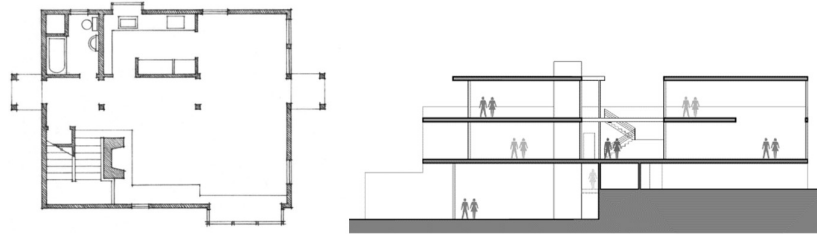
Hand-drawn floor plan of an apartment (left) and a Schematic cross-section of a multilevel building (right).
